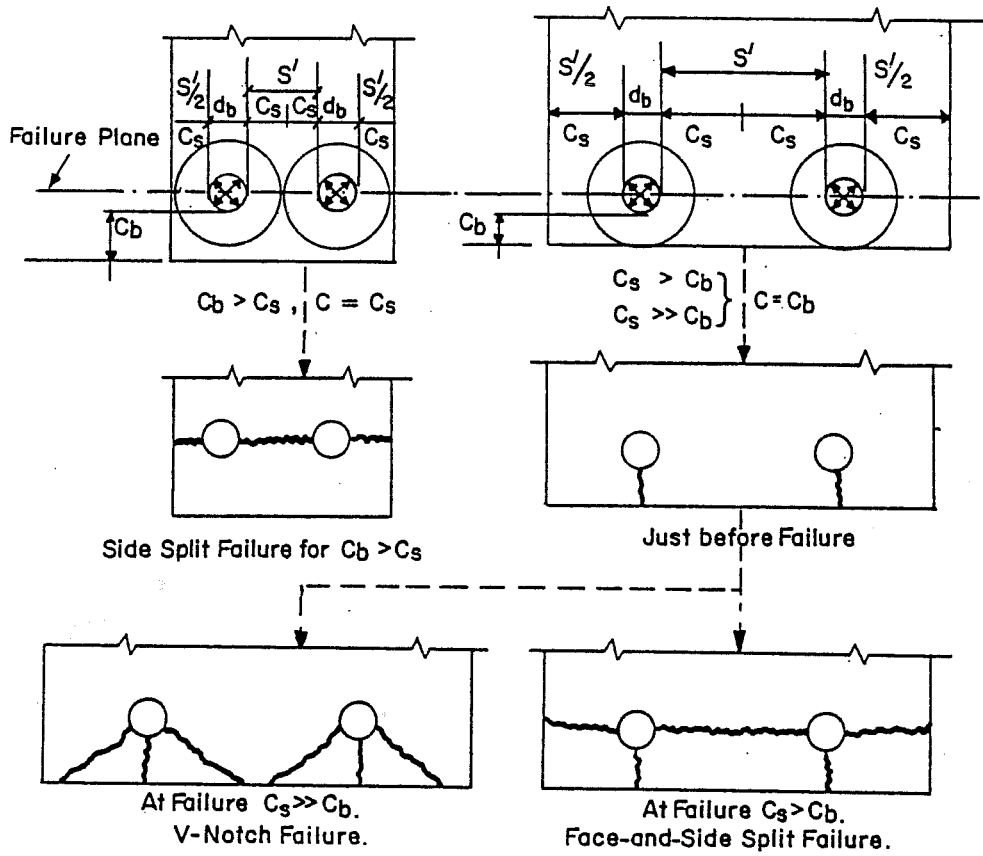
Failure patterns of deformed bars (ref. 1)
